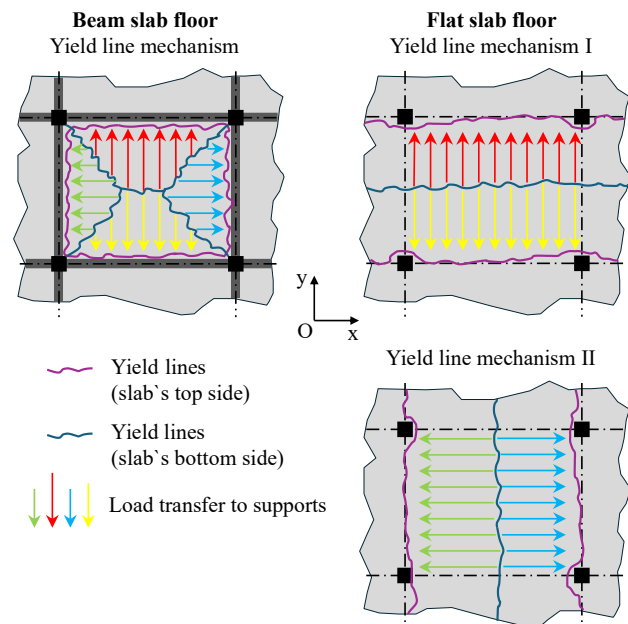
Failure mechanisms of beam slab floor versus flat slab floor, considering gravitational loading and uniformly distributed over the entire surface of the slab, considering (Khan & Williams, 1995)
